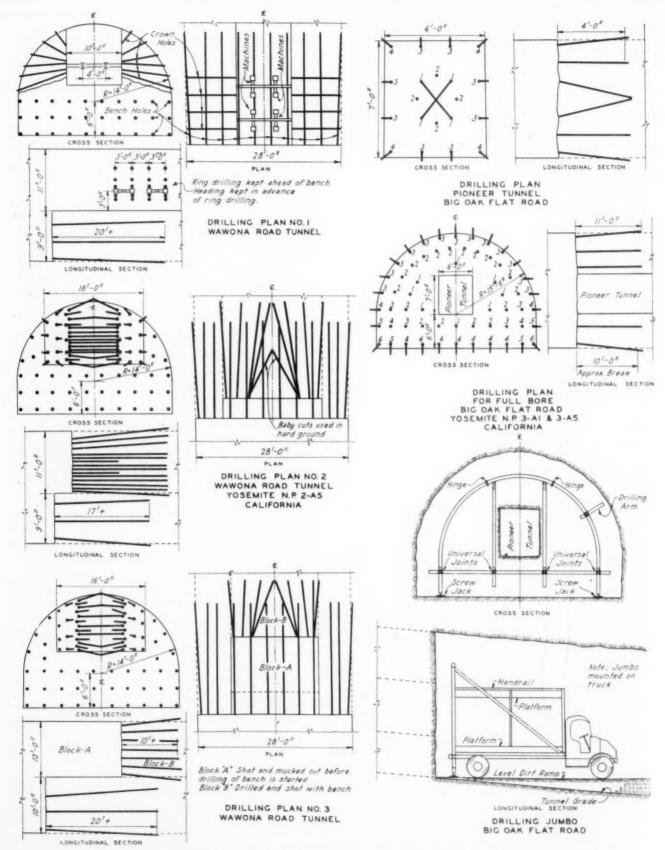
DRILLING PLANS FOLLOWED IN THE CONSTRUCTION OF WESTERN HIGHWAY TUNNELS; ALSO DRILLING JUMBO MOUNTED ON TRUCK.
